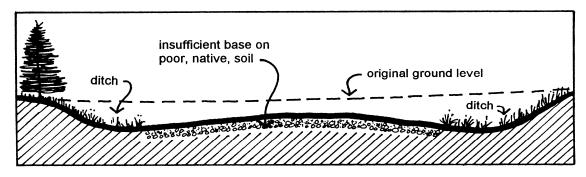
Poorly constructed road: poor base, inadequate ditching and built below original ground level.
